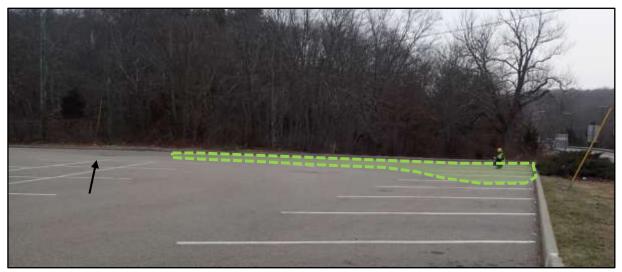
Dashes indicate approximate area of proposed bioretention basin at Flanders Plaza. Arrow indicates location of existing manhole to be retrofitted with diversion structure. Looking east.
